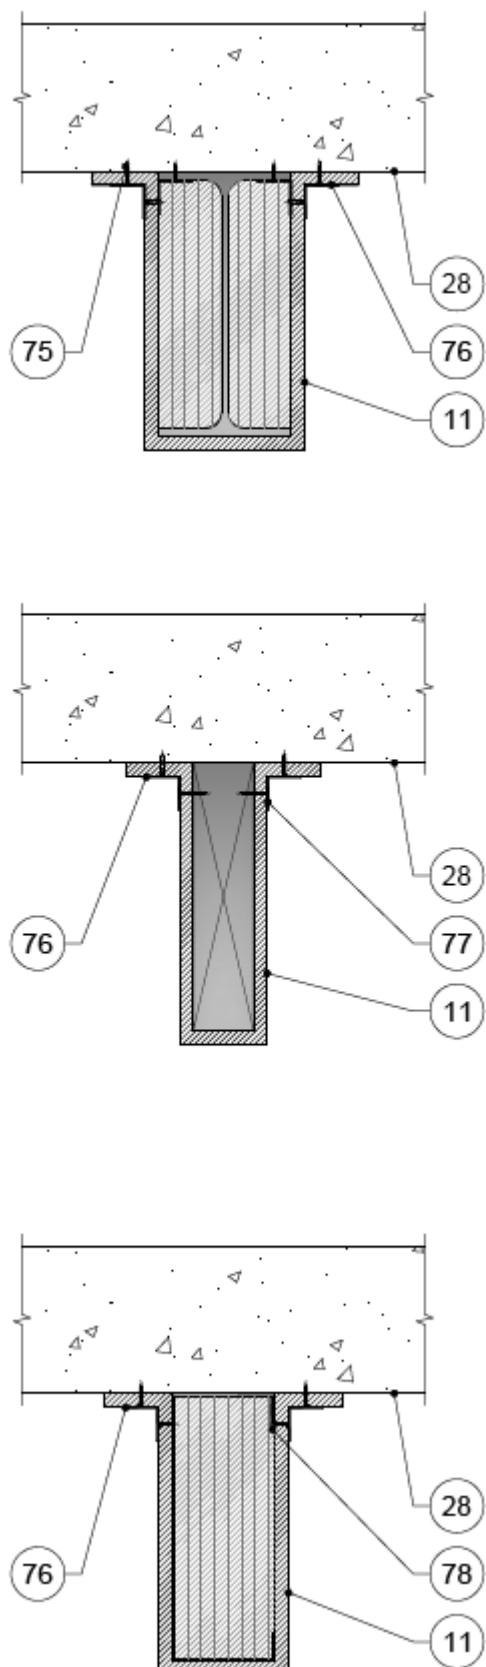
Section View of Cables and Pipes Installed in Horizontal Substrates
